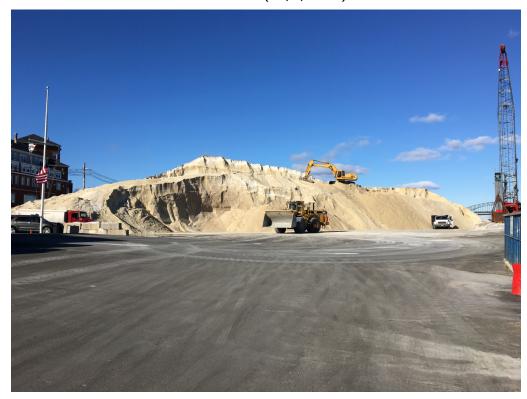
In front of the stone revetment looking northwest across the site at the salt pile (12/7/2018)
